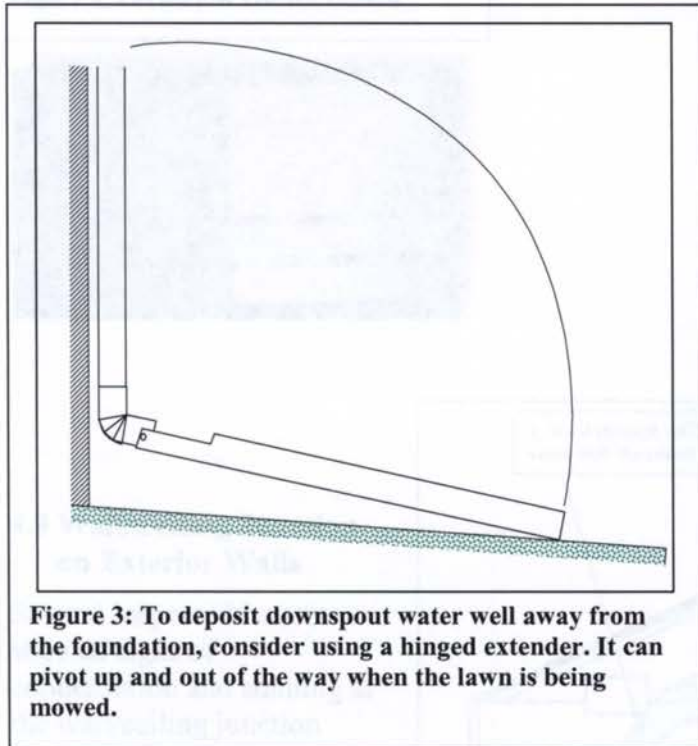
To deposit downspout water well away from the foundation, consider using a hinged extender. It can pivot up and out of the way when the lawn is being mowed.
